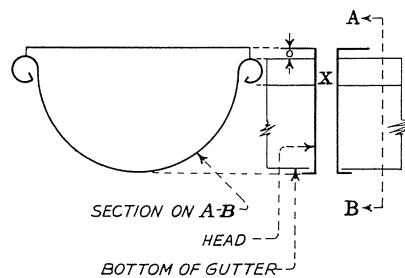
METHOD OF CONSTRUCTING EXPANSION JOINT IN EAVE TROUGH
